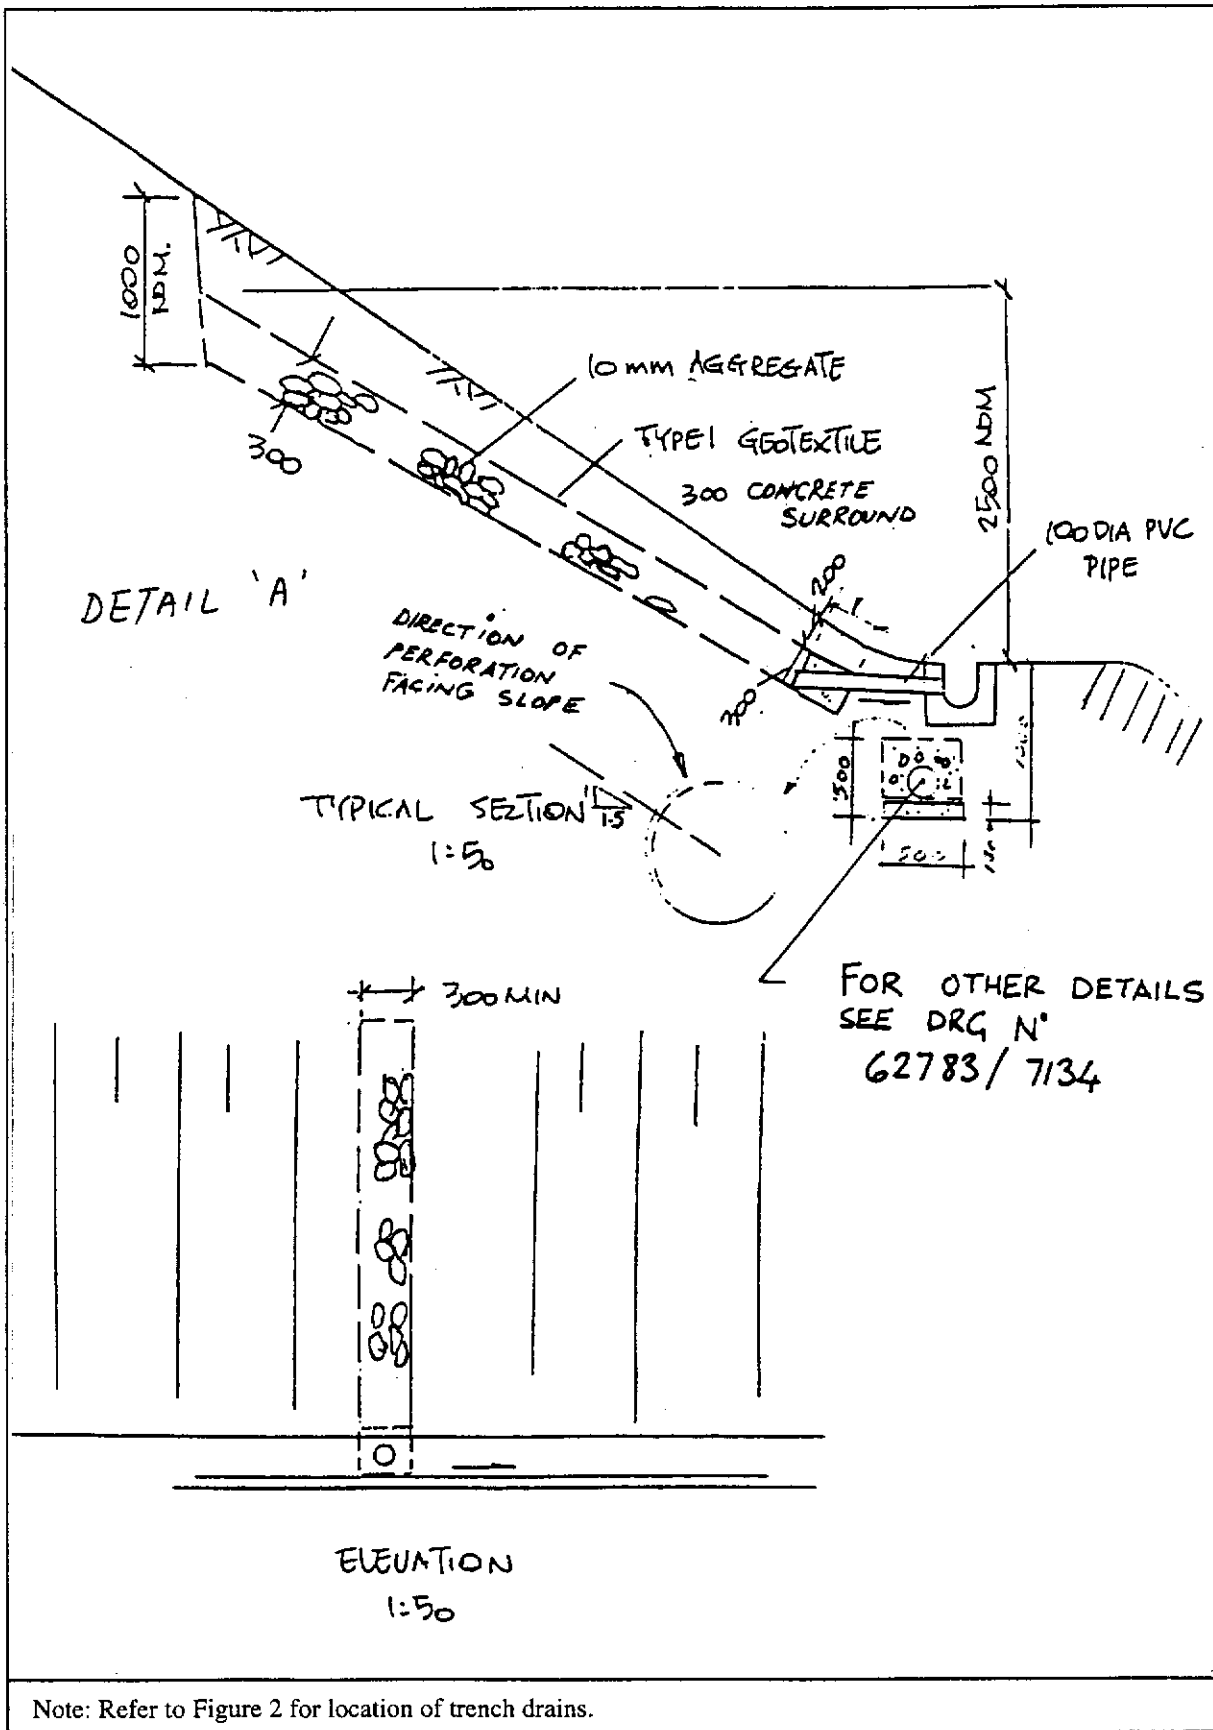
As-Built Detail of Trench Drains Installed in Slope No. 7SW-D/C866
